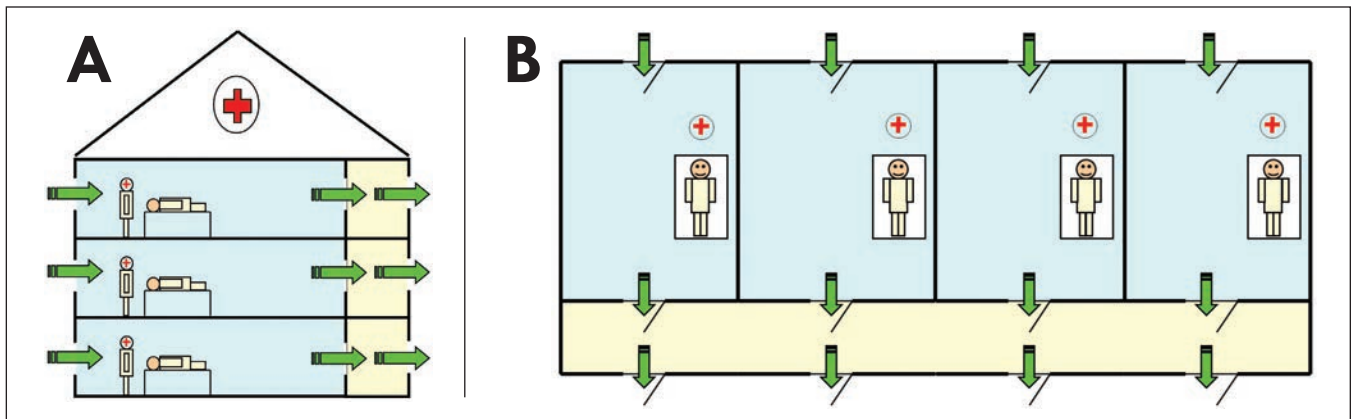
Wind-driven natural ventilation in the single corridor type hospital with wind entering the ward first. A) Section plan; B) floor plan.²
